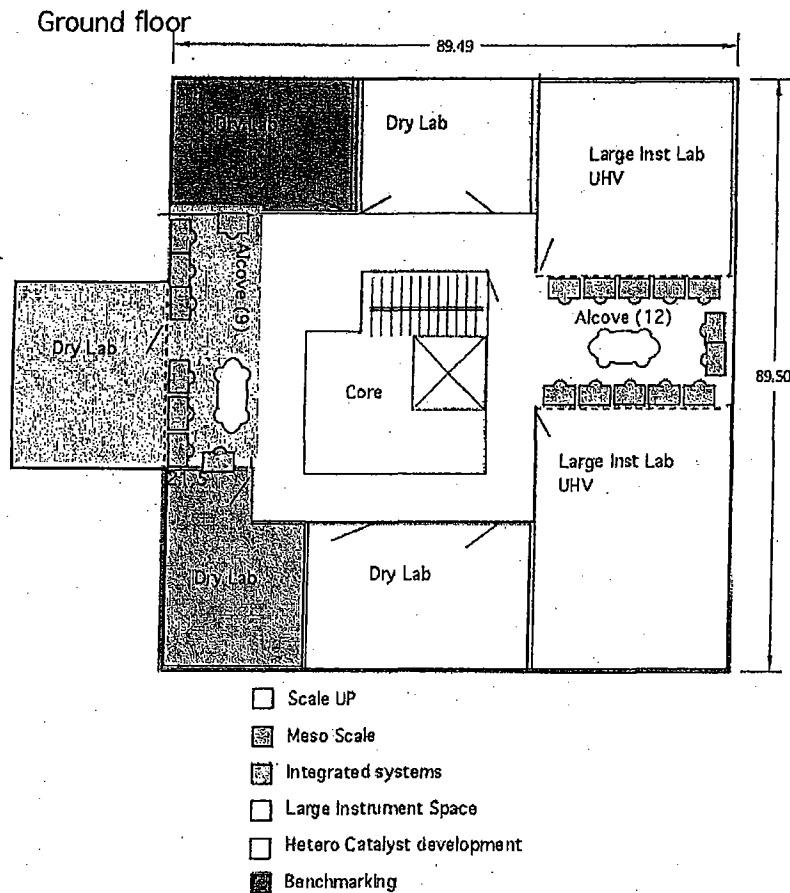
Conceptual Layout of Ground Floor of Caltech Hub
